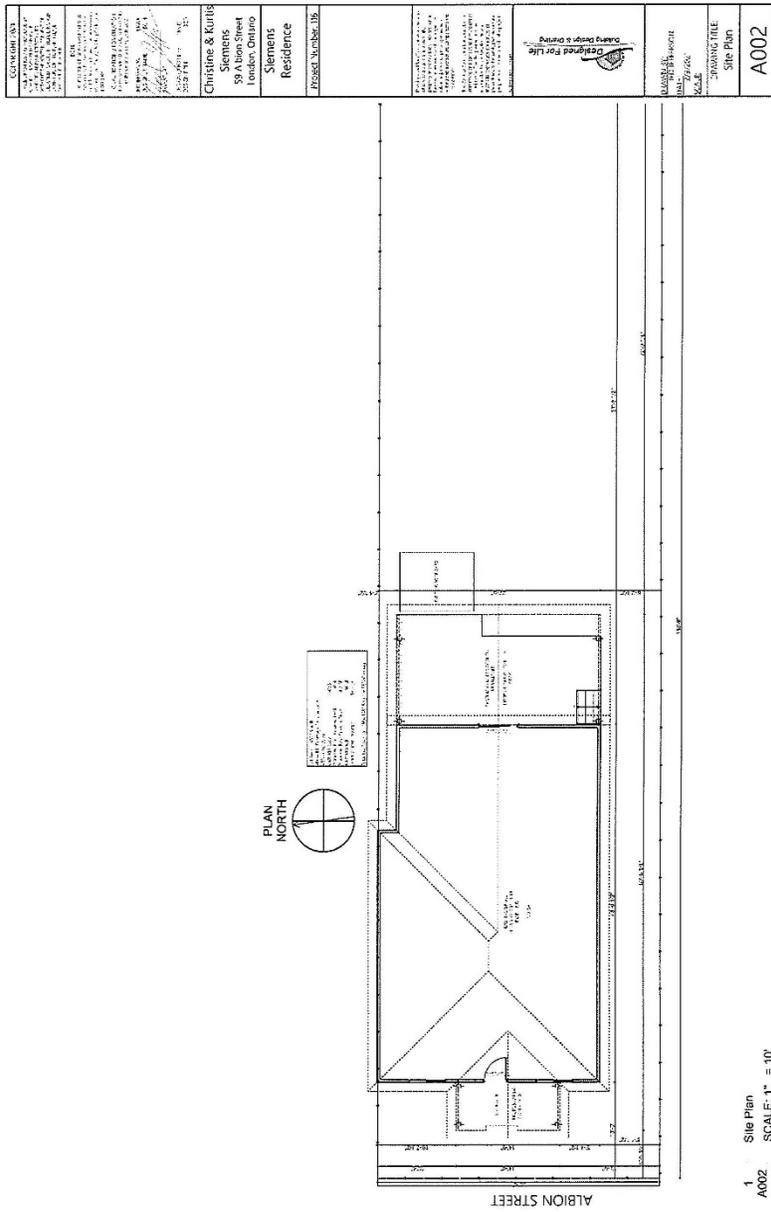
Drawing submitted as a part of the Heritage Alteration Permit application for the property at 59 Albion Street showing the proposed porch design. Note, the rear porch is no longer being pursued.
